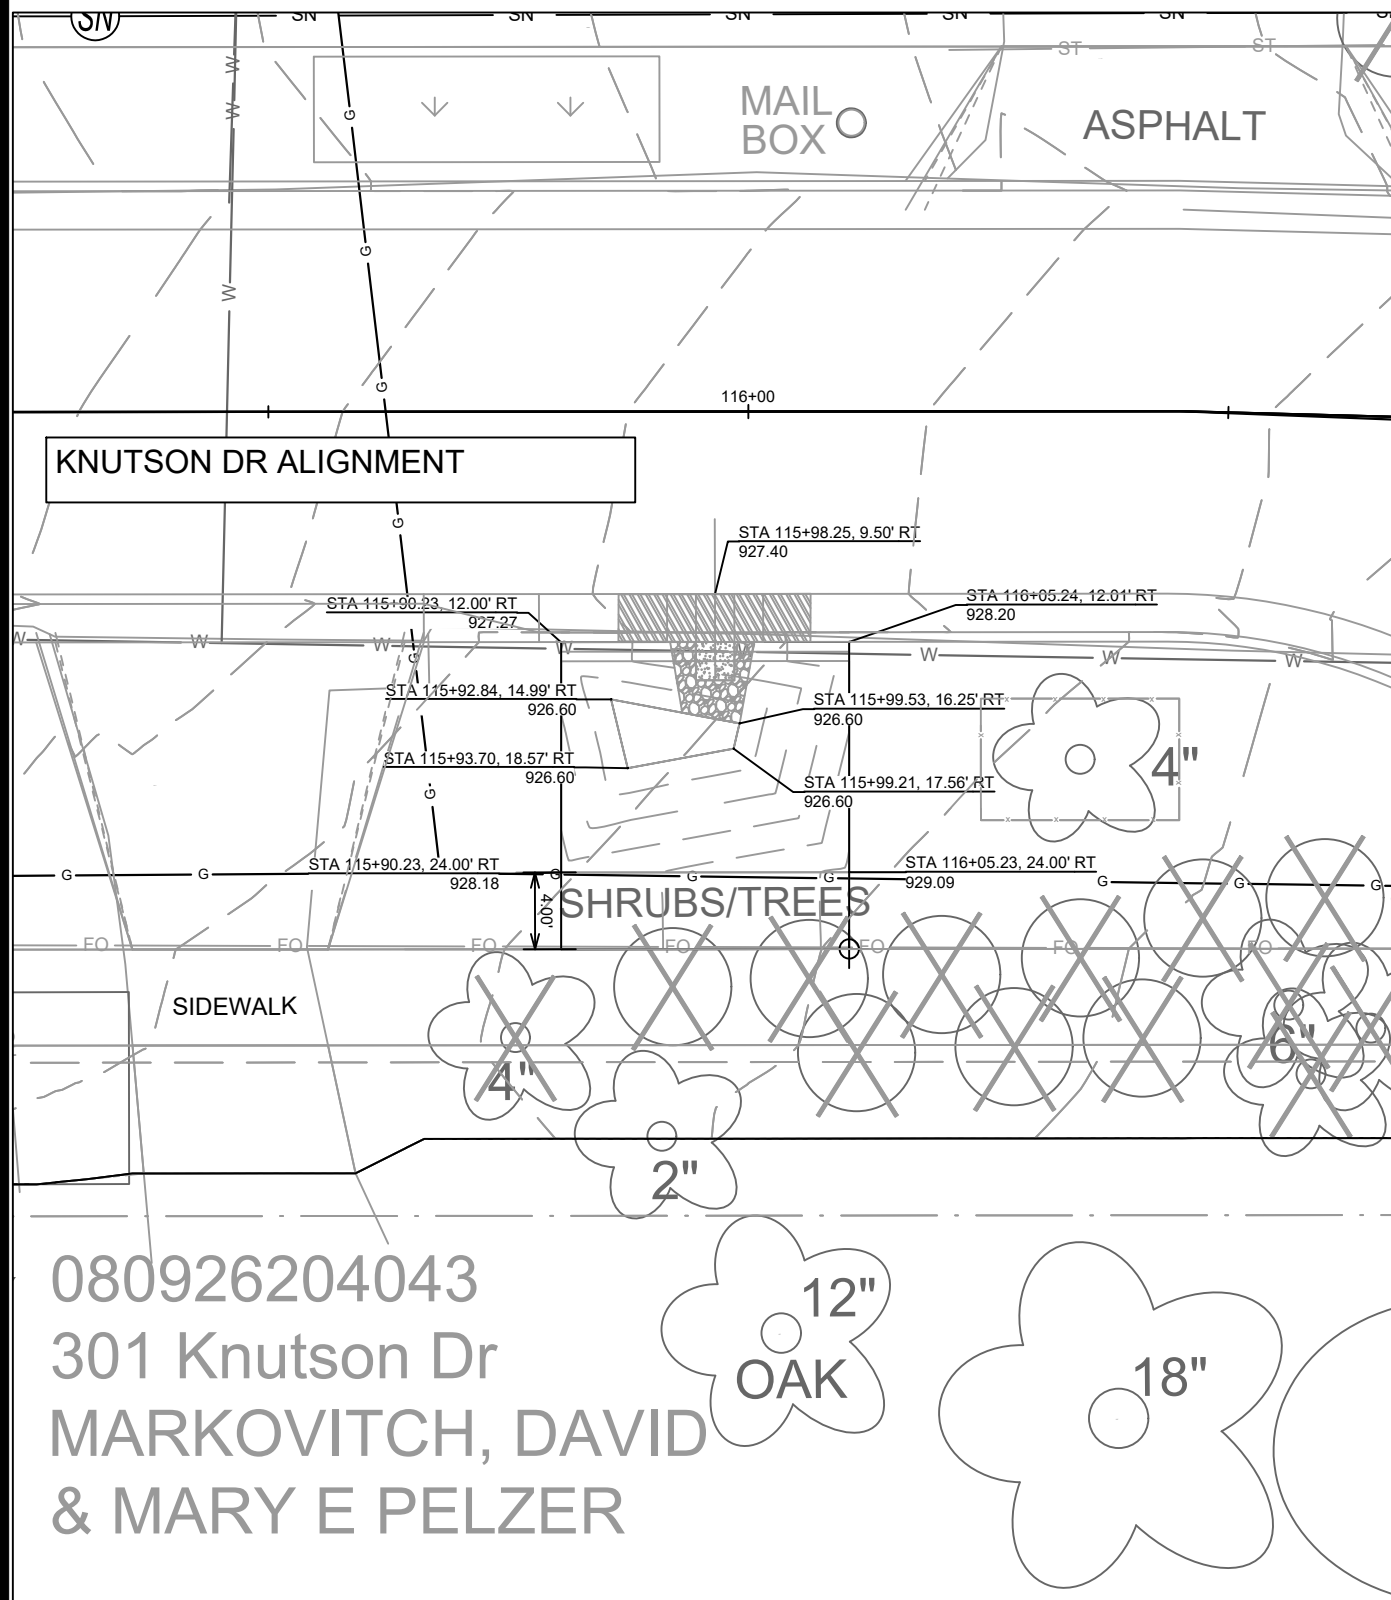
DETAIL POINT ELEVATIONS/DESCRIPTIONS
